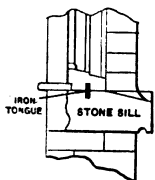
Section of Window Frame, Showing Iron Tongue.
